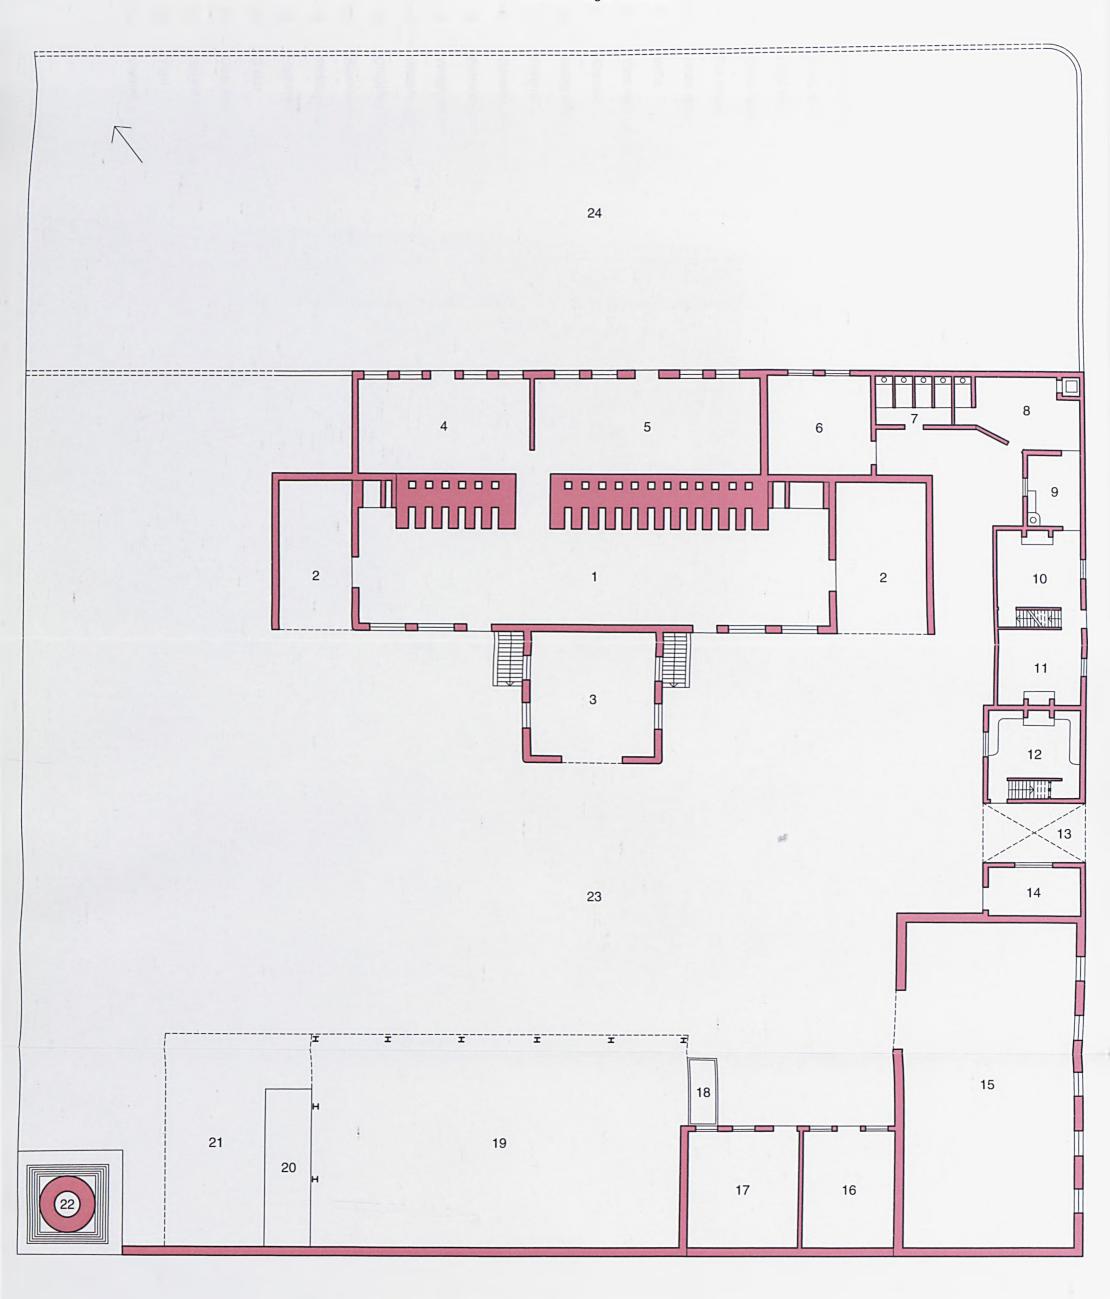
Ground plan of the Huntsman Coleridge Road steelworks, redrawn from the architect's planning drawings of 1898. Scale 1:200 (author).
